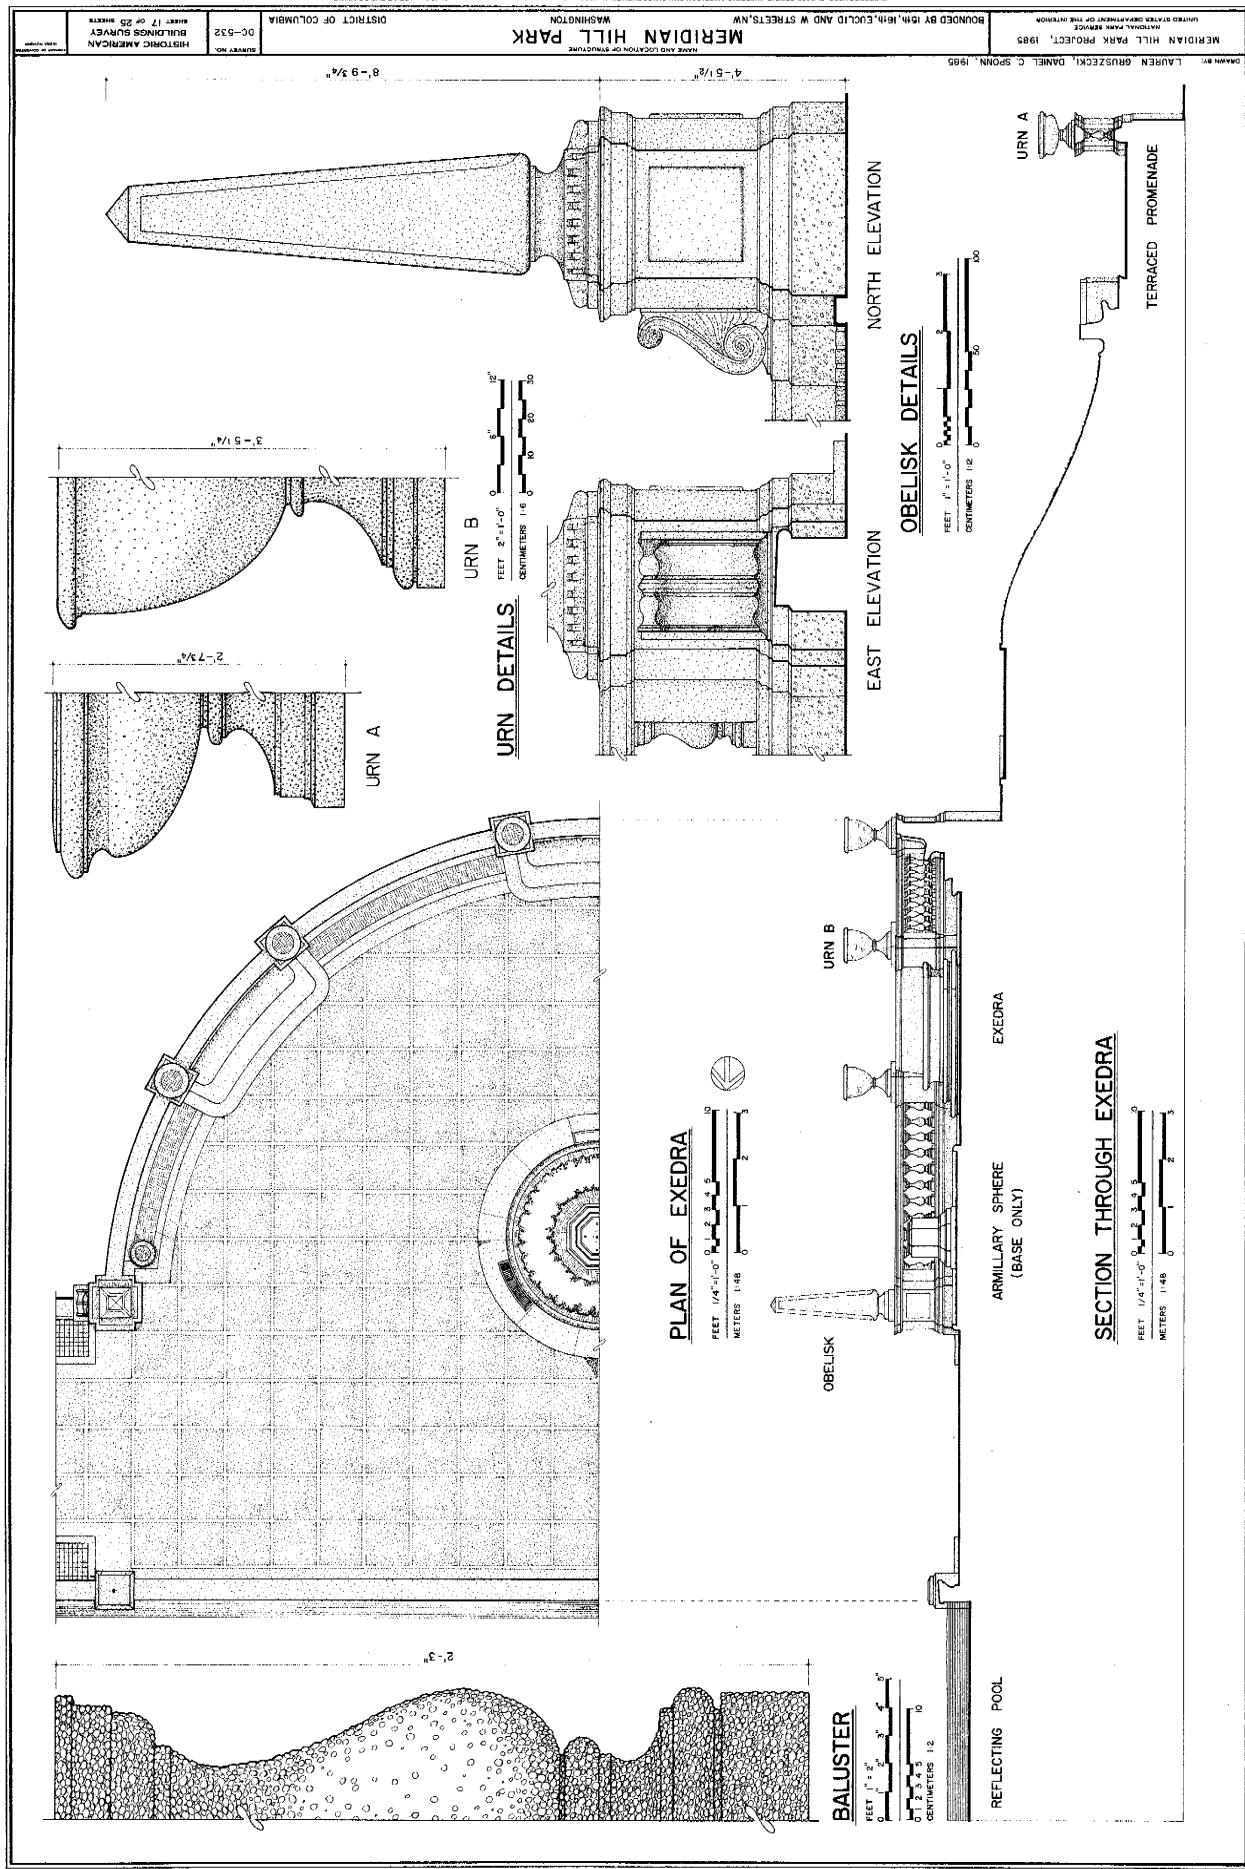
Objects and features within a landscape sometimes merit individual documentation. This Neoclassical exedra was comprehensively documented with a plan, section, elevation and large scale details of decorative elements, all dramatically arranged on the sheet. (HABS DC-532)
